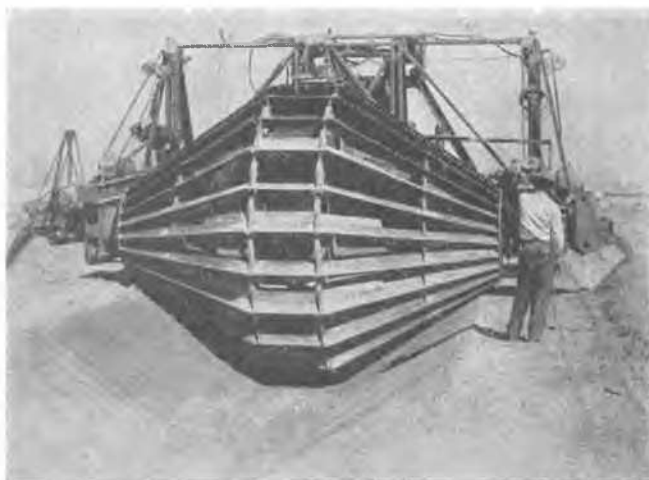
Construction of Compacted Earth Lateral—Gila Project, Arizona
